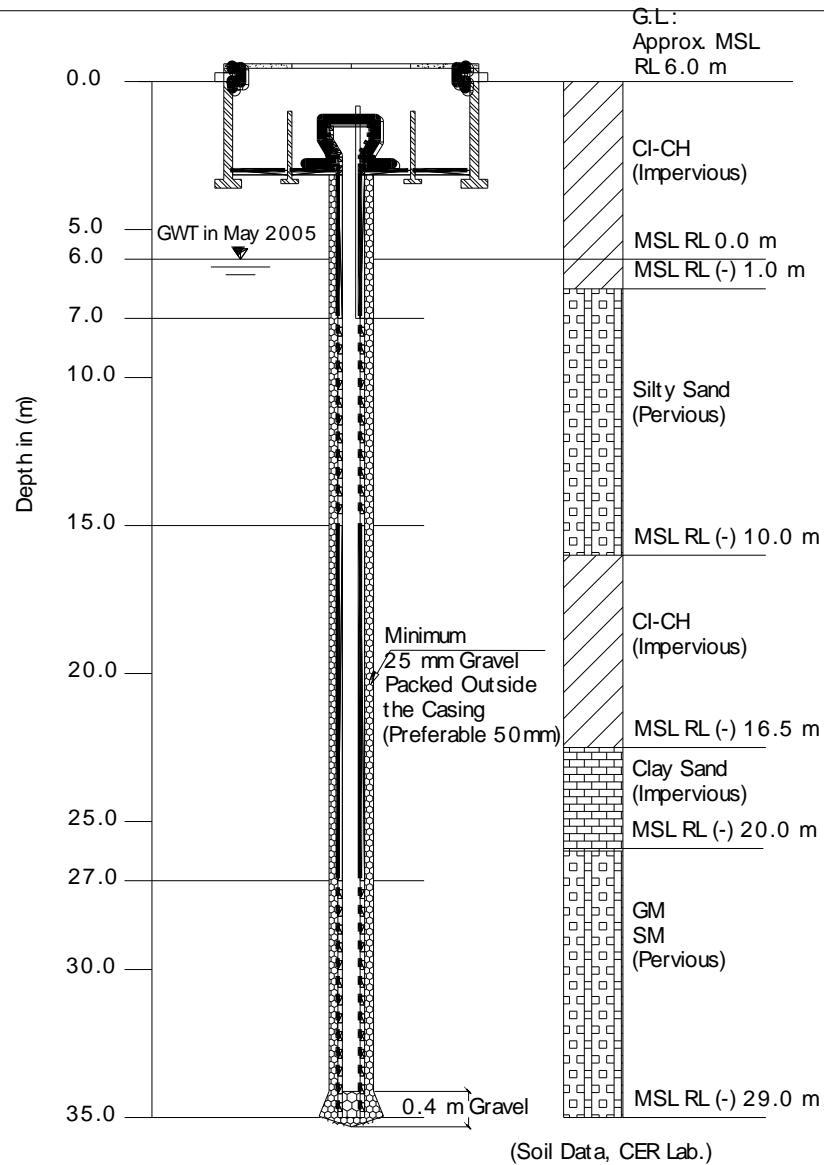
Typical Cross Section of Bore at full Depth at Botanical Garden, Surat
